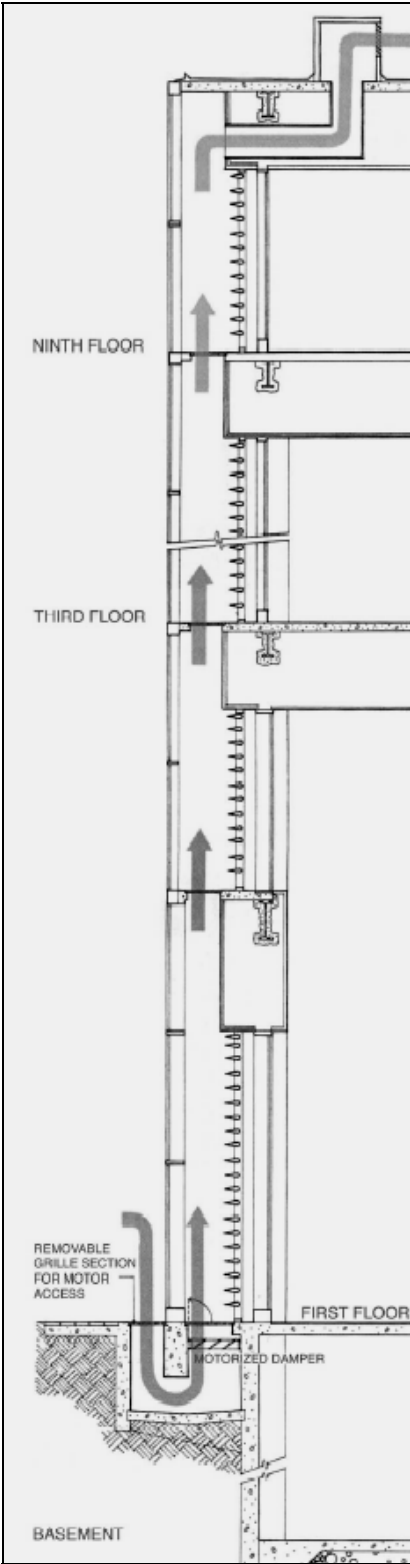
Wall Section through the Facade of the Hooker Building [5]
